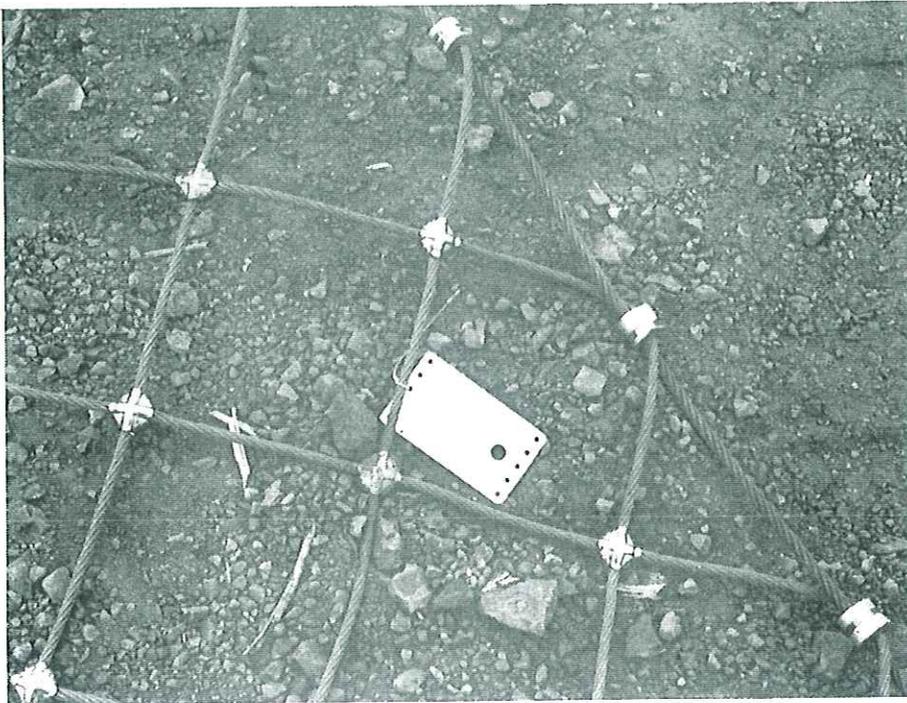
CLOSE-UP OF BRUG WOVEN WIRE ROPE NET SHOWING GRID SPACING, NET FASTENERS, AND BORDER ROPE
